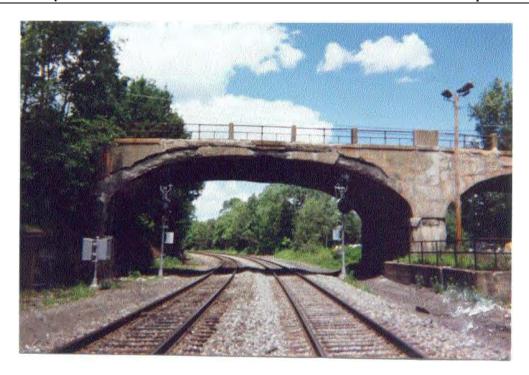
Looking north at south fascia of the west arch over the NJ TRANSIT Montclair-Boonton Line (formerly the DL&W Railroad). Note: Large area of the spandrel wall and edge of arch ring heavily spall (Photo taken prior to repairs in 2000).
